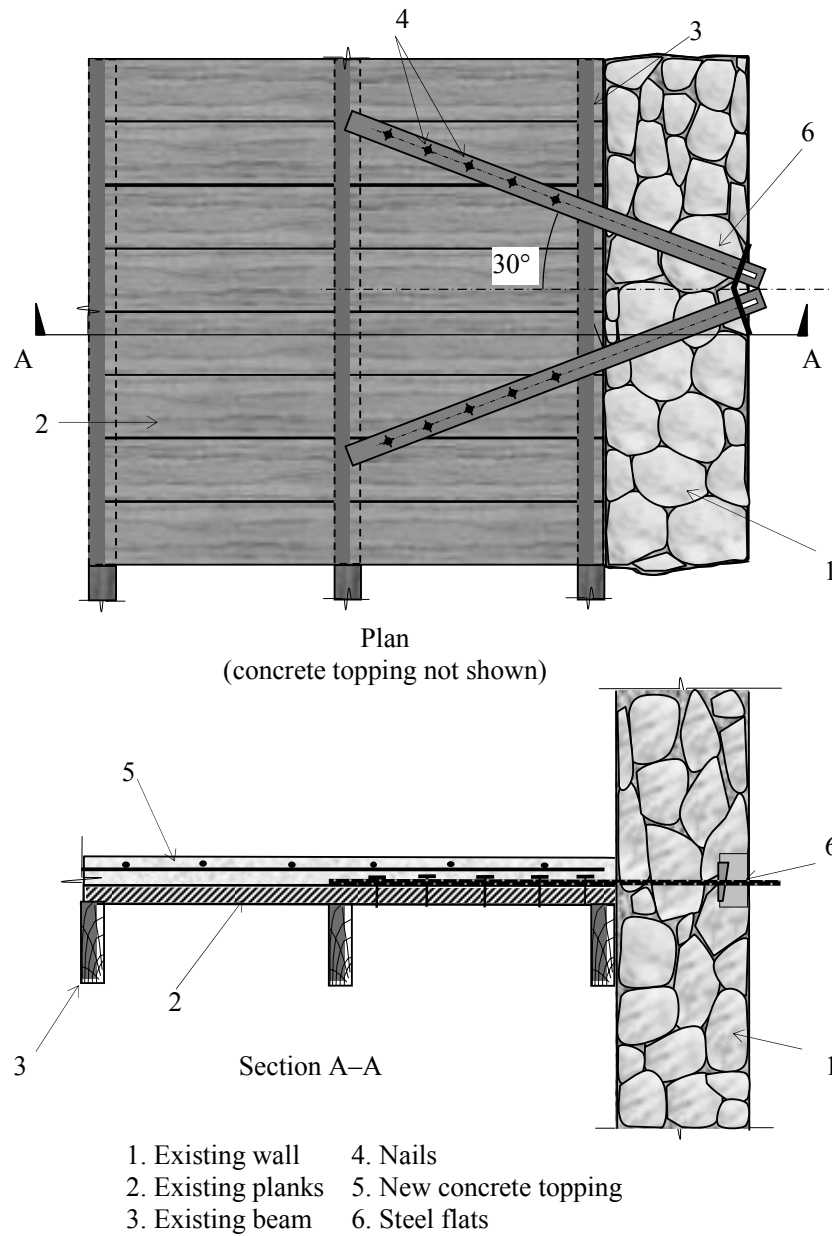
Connection of floor to wall (beams parallel to wall)
